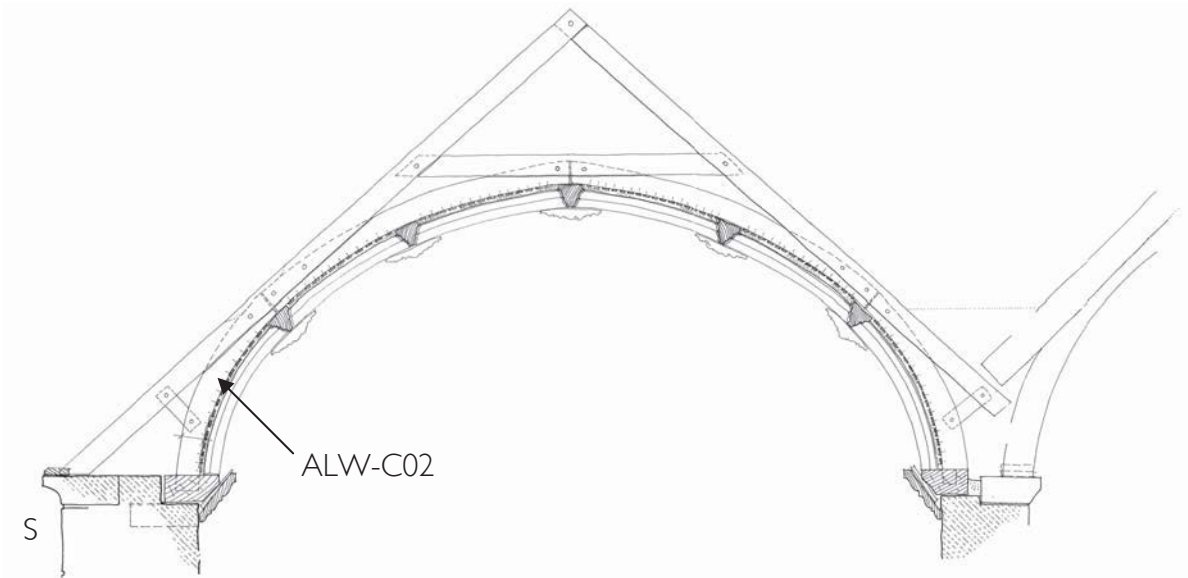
South aisle; truss 1.2, showing the location of sample ALW-C02 (based on example truss provided by Oliver West & John Scott Architects)
